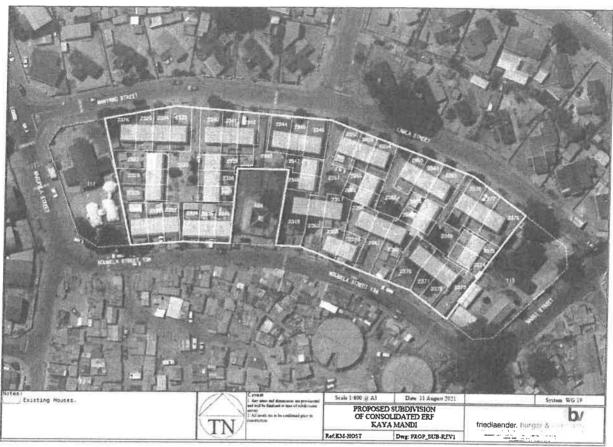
PROJECT 4B - PROPOSED CONSOLIDATION & SUBDIVISION
